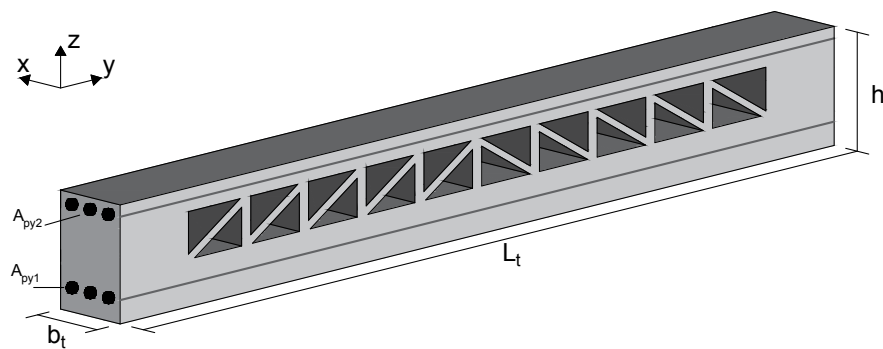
Open truss girder design with directions and indicated prestress cables
